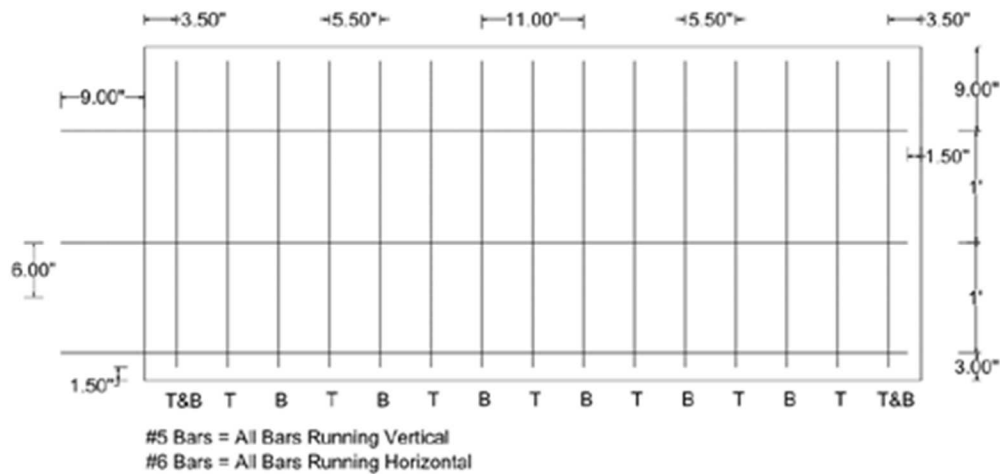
Reinforcing Steel Layout of Right Deck Panel
